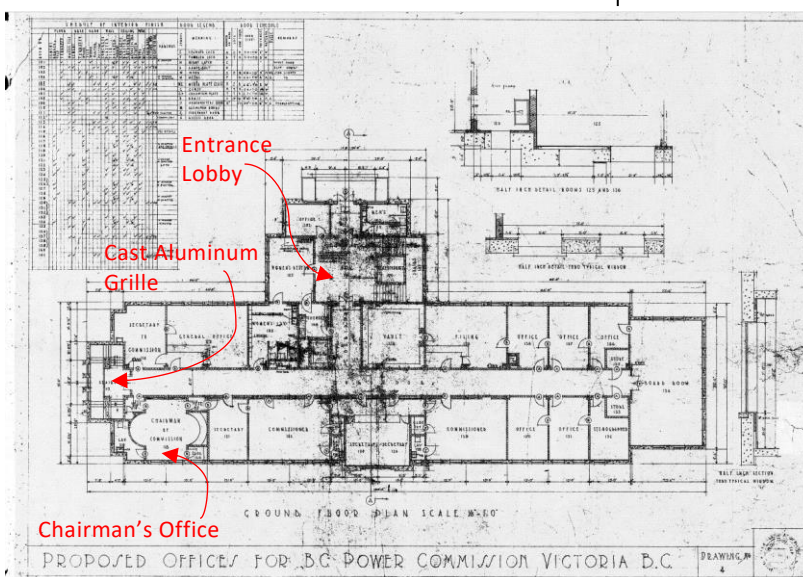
Ground Floor Plan (North Entrance) – Level 3
